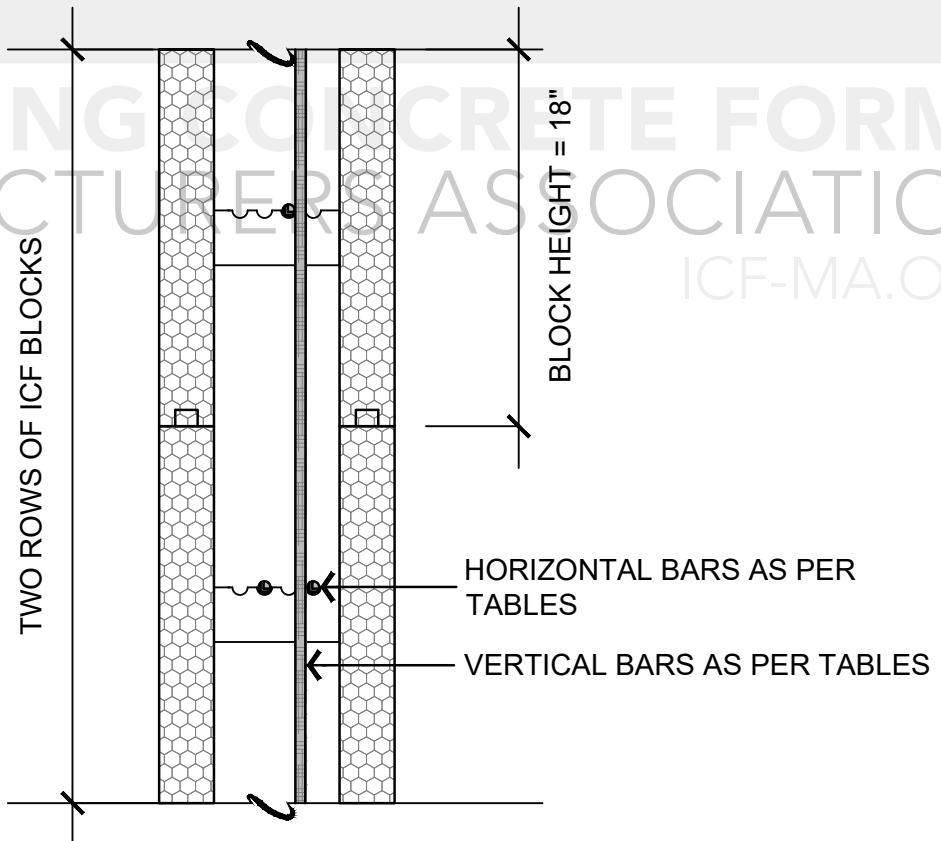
Above Grade Wall Reinforcing Placement for 6", 8" and 10" Thick Walls.
